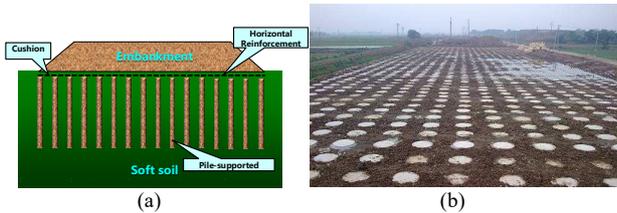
Rigid pile-supported embankment (a) sketch of the method (b) photo of the method.
